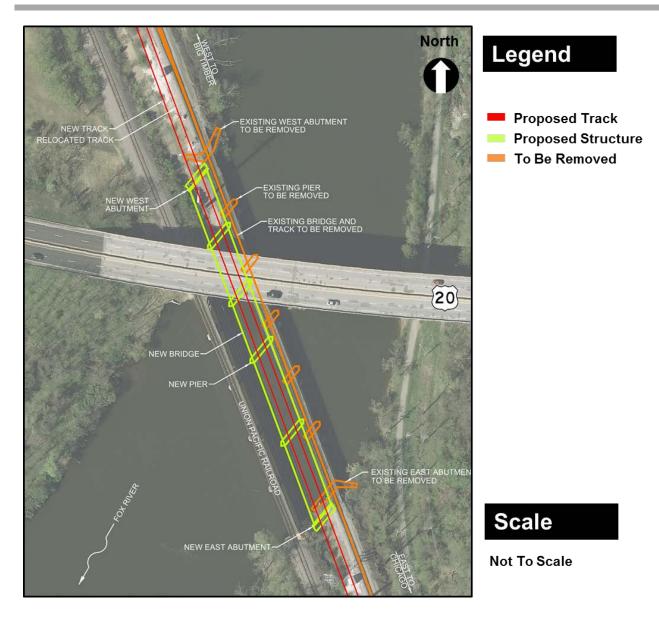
B: Components of Alternative 1B – Construct a New Double Track Bridge on New Alignment West (Downstream)
